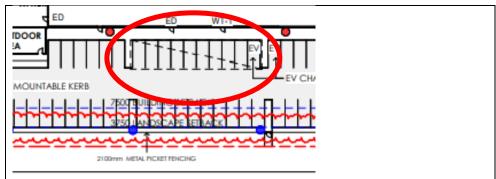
Architectural plan – Unclear what dashed line indicates – possible impact on landscaping to be clarified/addressed.
